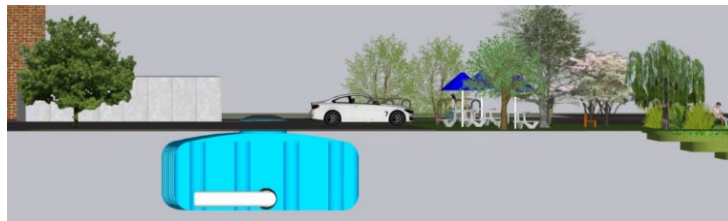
The Large underground Cistern between the green house and Reserved Parking lot looking north at the edge of Area 1 and Area 2.
